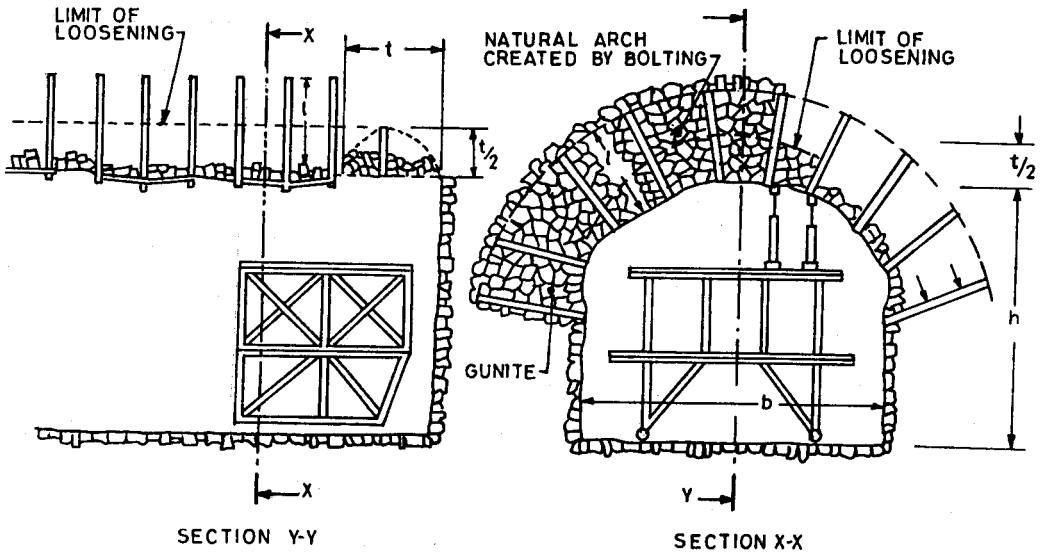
DIAGRAMMATIC SECTION DEMONSTRATING OF ROOF BOLTING
